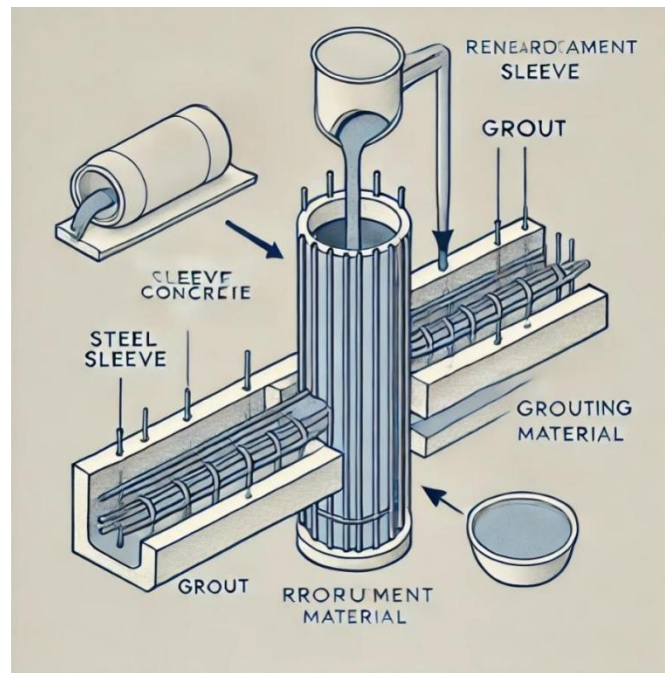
Schematic of Reinforcement Sleeve Concrete Grouting Connection
